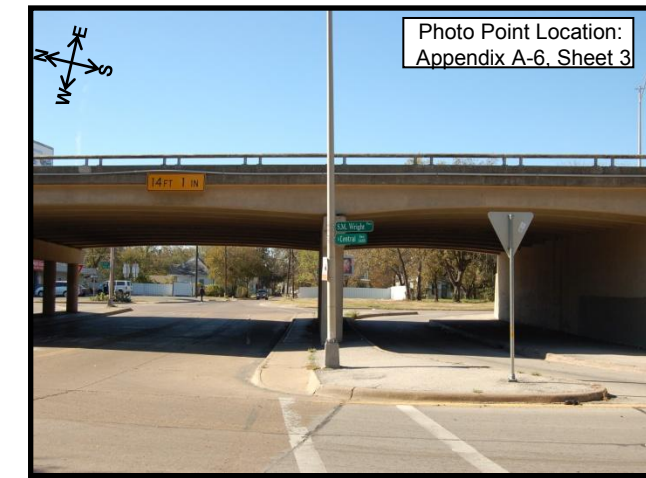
Poplar Street and SM Wright – looking southeast at existing residential development.
